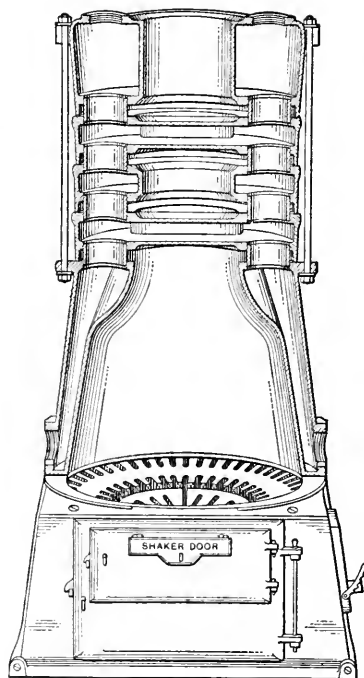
CAPITOL-WINCHESTER STEAM BOILER.
